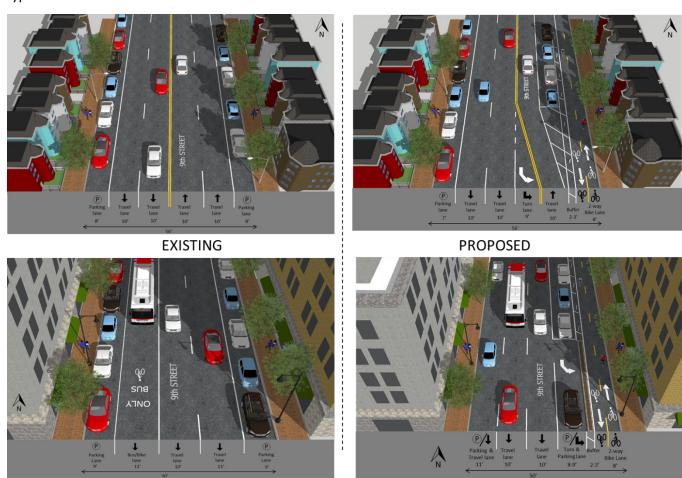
Existing and Proposed Cross-Section for Alternative 4 along 9th Street
